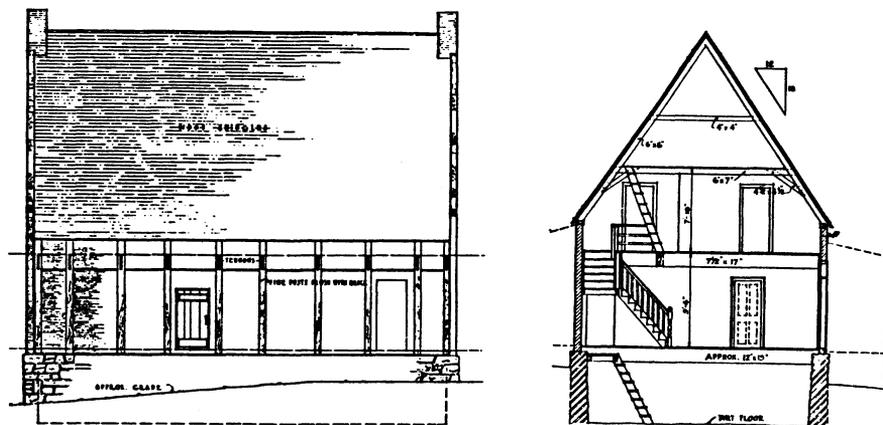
Eighteenth-century timber frame with brick cladding on front and side walls. Jan Breese house, Rensselaer Co., N.Y. (Historic American Buildings Survey, NY-5A-2.)
